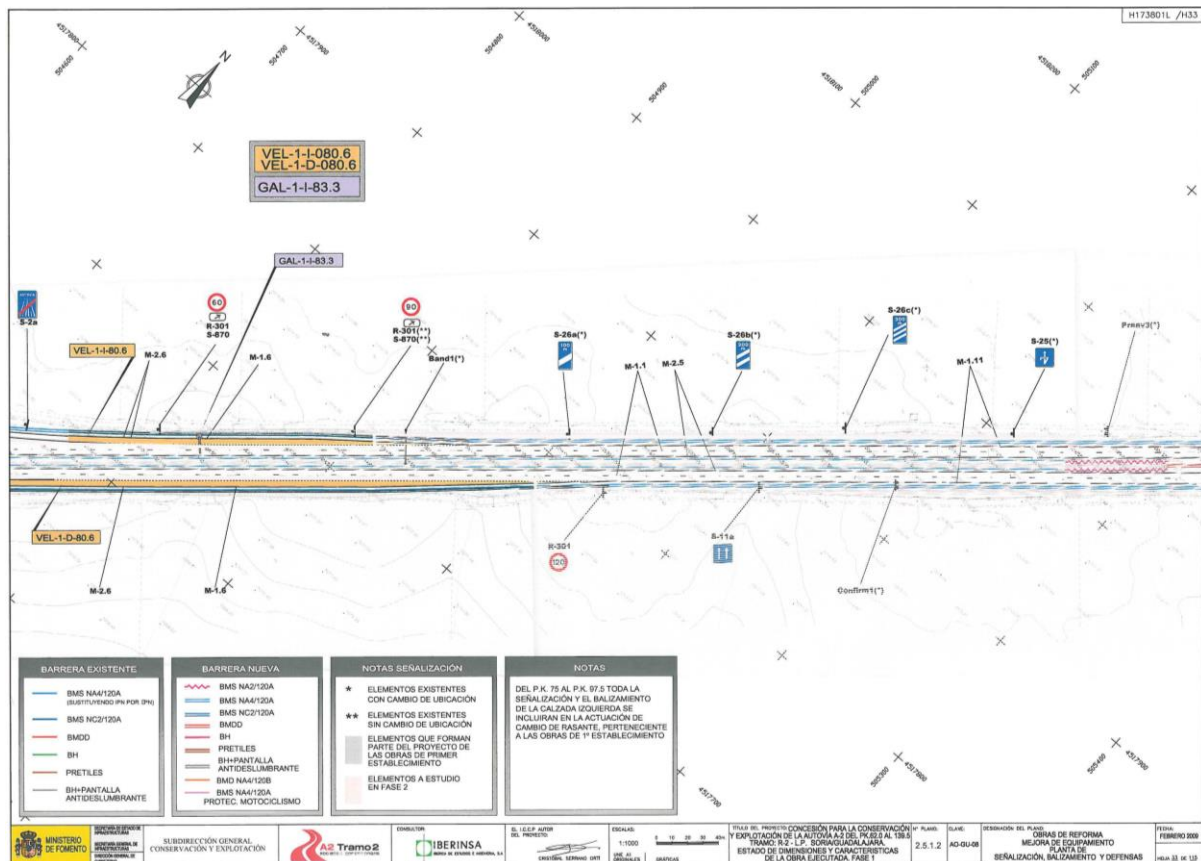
Indicative layout plan of a small section of A2 including information on signalling, geometry, etc.
